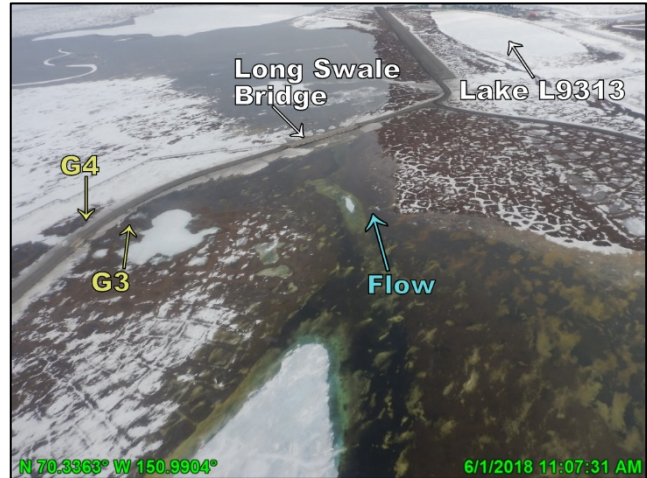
Flow under the Long Swale Bridge, looking northeast; June 1, 2018
